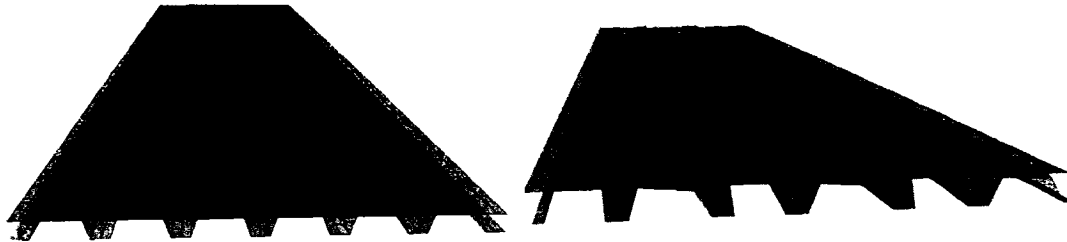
Undeformed (left) and deformed (right) shape of small-scale steel deck model with roofing elements (Yang, 2003)
